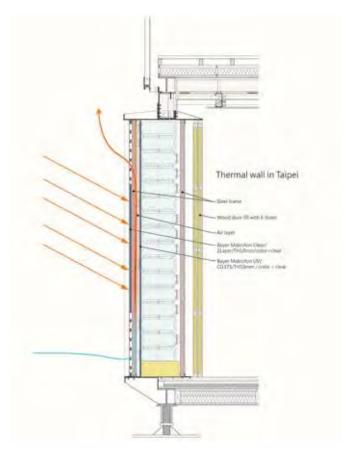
Thermal Wall Detail in Taipei
